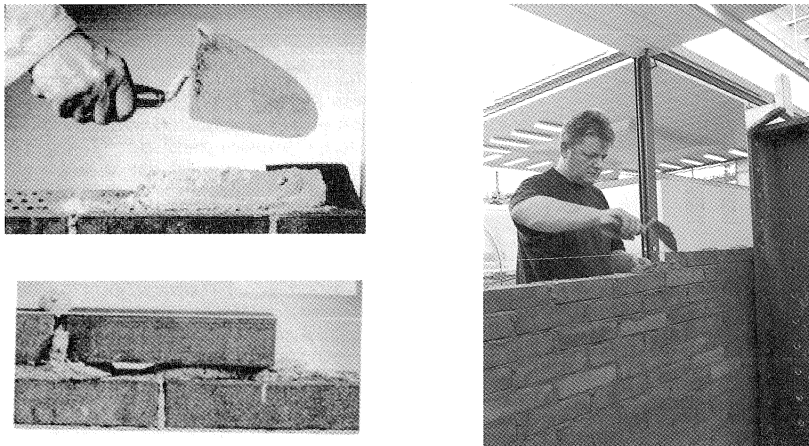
a) Example of a poorly filled joint (left). The brick was squeezed into the fresh mortar but too much of the mortar was scraped against the head of the previous brick with the brick being placed. b) Laying bricks seen from the back side of the wall (right).
